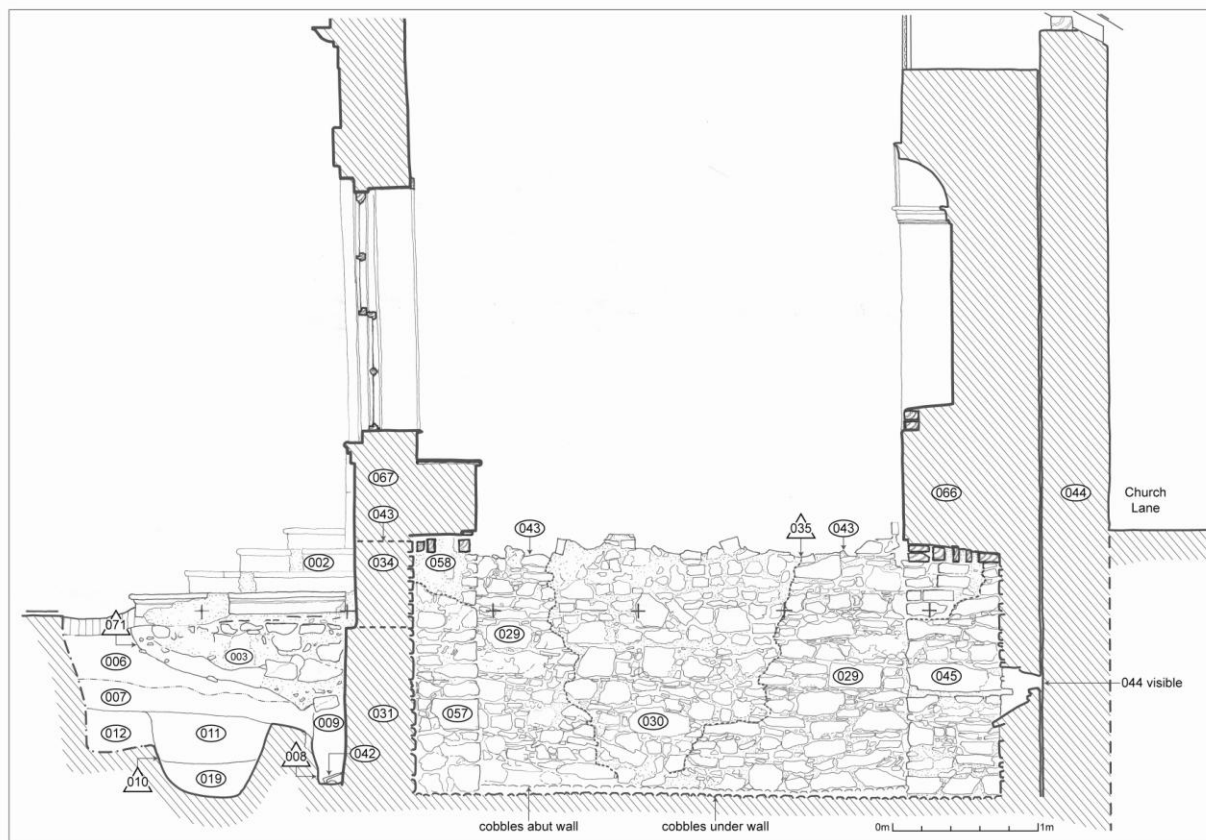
Elevation of internal north-east wall and Cutting 1 section, phased below
